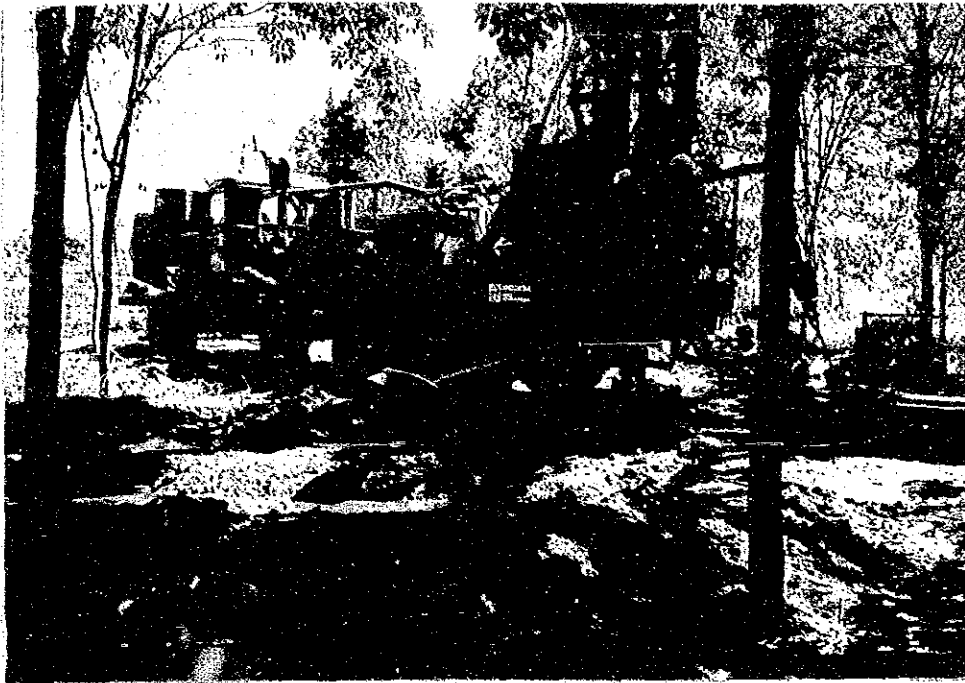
Trench for Bulk Sample at Bang Sai Deposit
